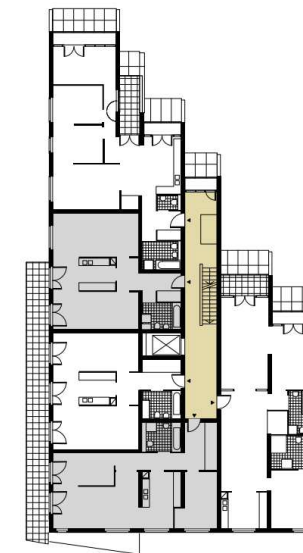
Wernik Architekten. (1994). Typical floor plan. [Architectural plan]. <https://cris.brighton.ac.uk/ws/portalfiles/portal/4752385/FRENCH%20H%20PhD.pdf>
